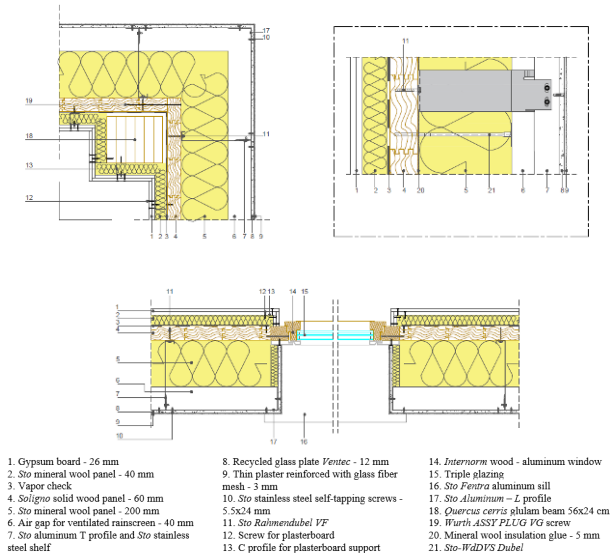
Ventilated rainscreen construction detail: corner (hor. sect.); typical (vert. sect.) and window (horizontal section).
